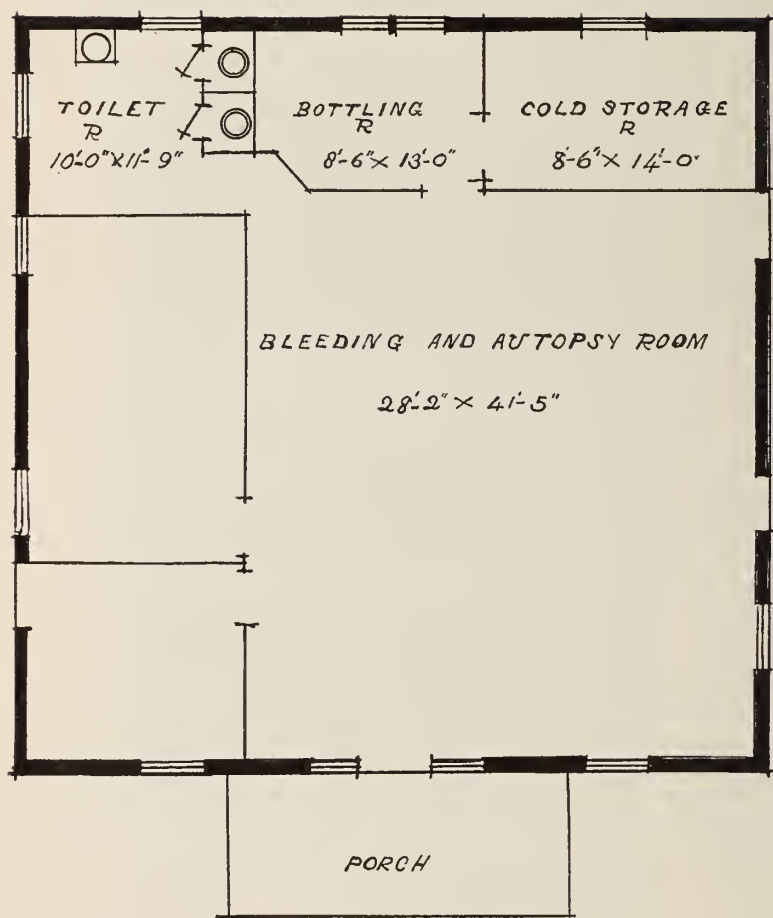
The building which has been remodeled for use in serum production. Bleeding and autopsy room, cold storage and bottling rooms on the first floor. Laboratory rooms on the second floor.
